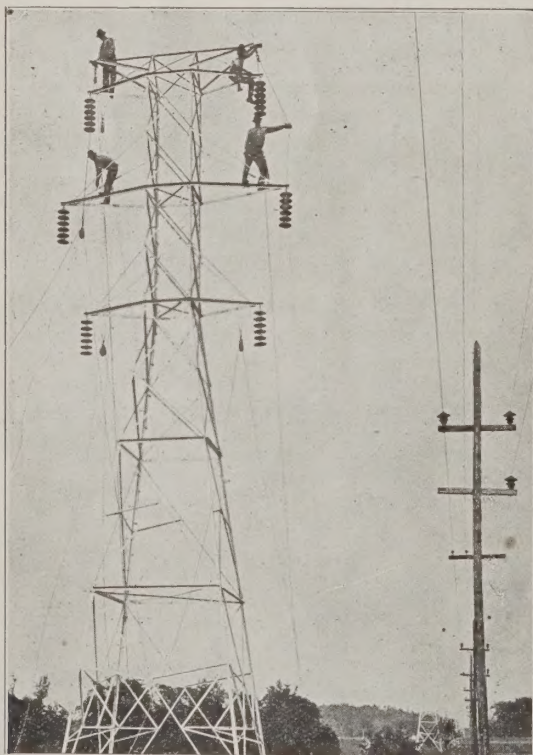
THE DOUBLE CIRCUIT STEEL TOWER CONSTRUCTION USED BY ALABAMA POWER CO., AND TEMPORARY WOOD POLE LANE.
